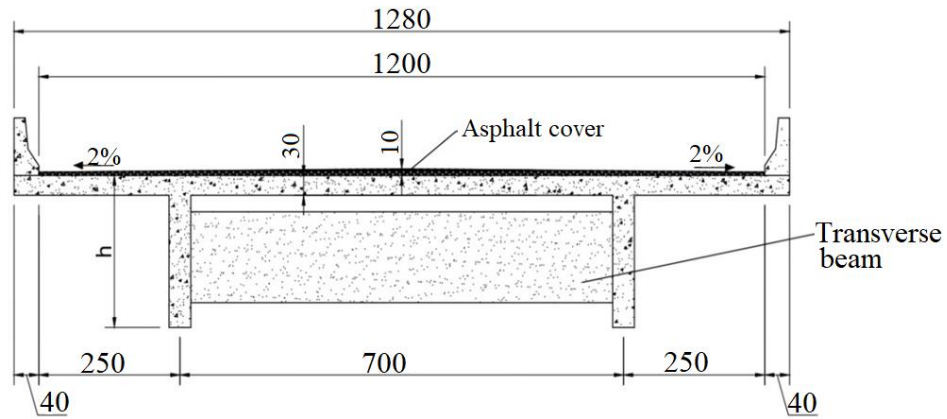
Cross section of the bridge (dimensions in centimeters) (Own Author, 2019).
